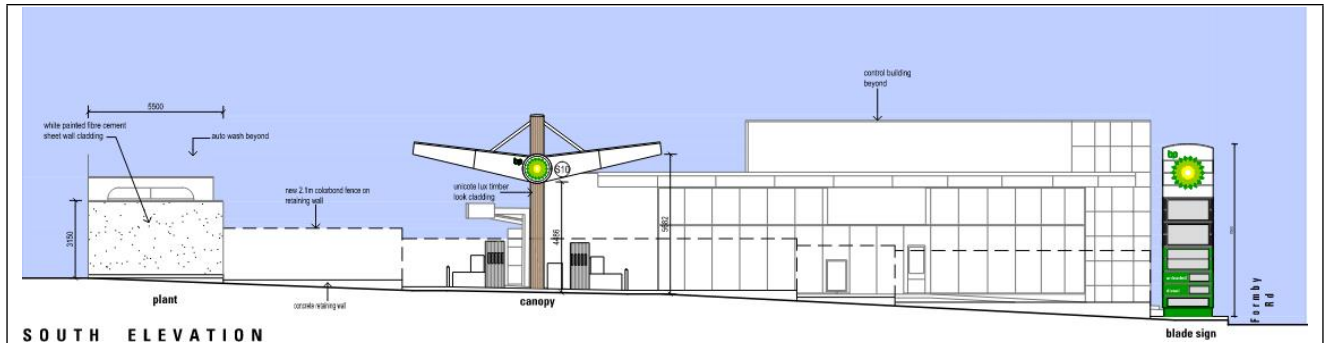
Southern elevation viewed from boundary (Source: Ratio)
